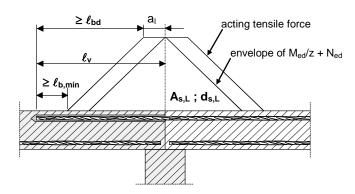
Overlap joint for rebar connections of slabs and beams
